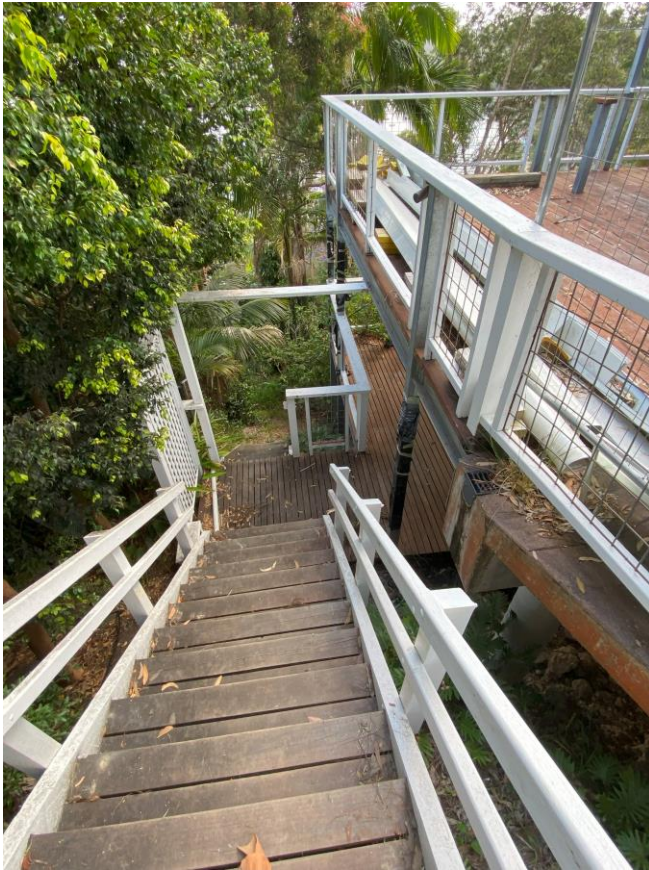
The existing stair entry to the dwelling from the street frontage (to be demolished)
